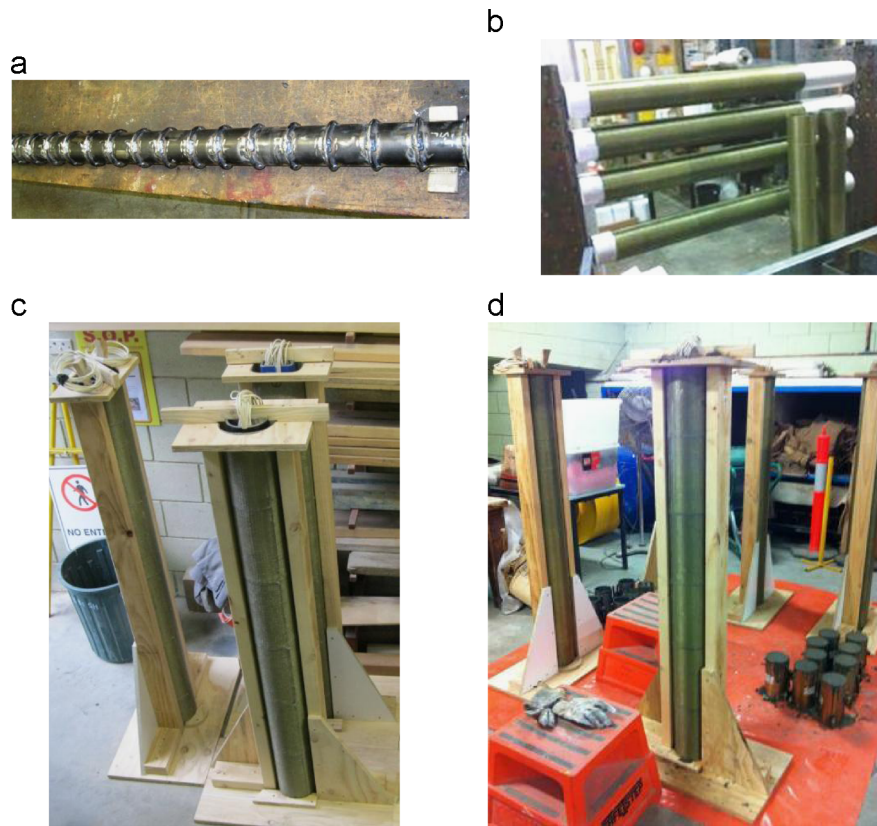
Manufacturing process: (a) steel tubes; (b) manufacturing of FRP tubes; (c) specimens before concrete pouring; (d) specimens after concrete pouring.
